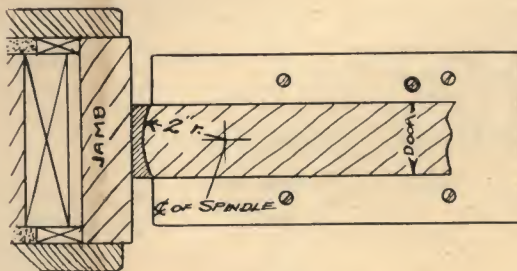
# DETAILS FOR APPLICATION OF RUSSWIN CHECKING FLOOR HINGES
